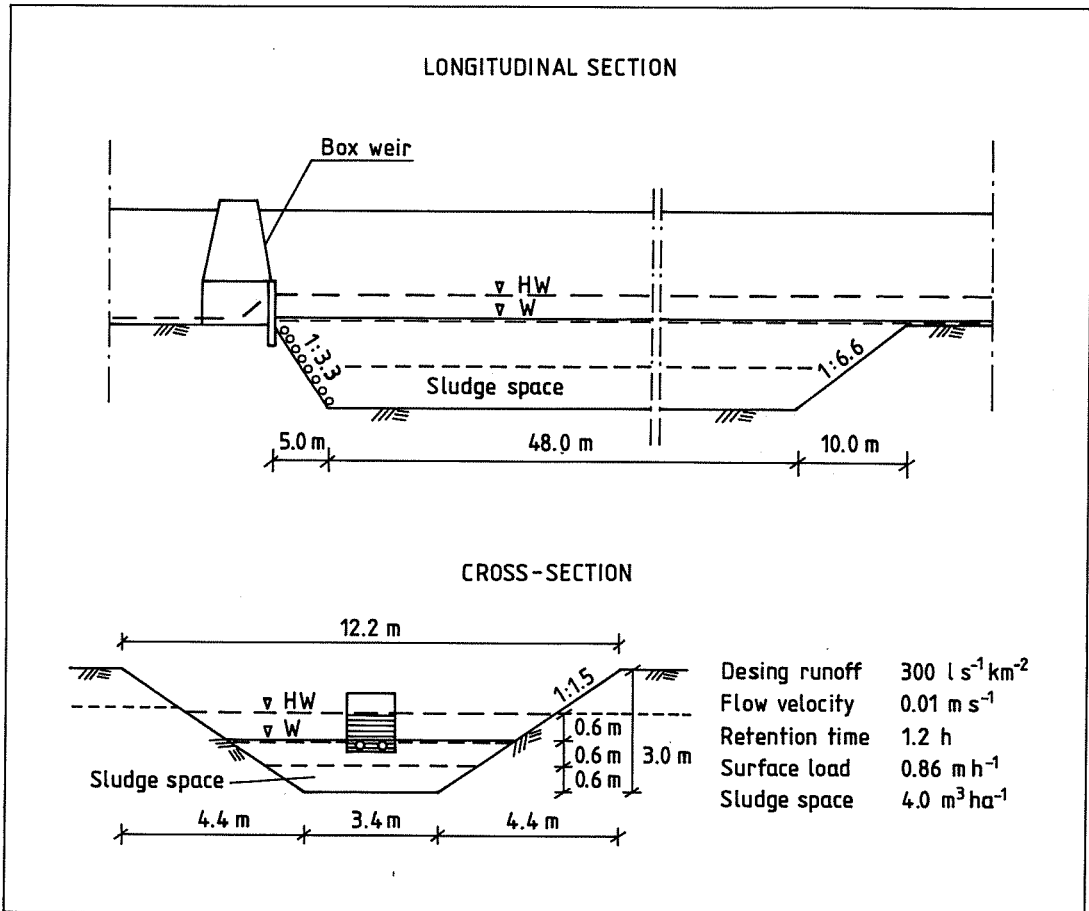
Longitudinal and cross-sectional drawings of the sedimentation basins at Murtosuo, with dimensioning values.
